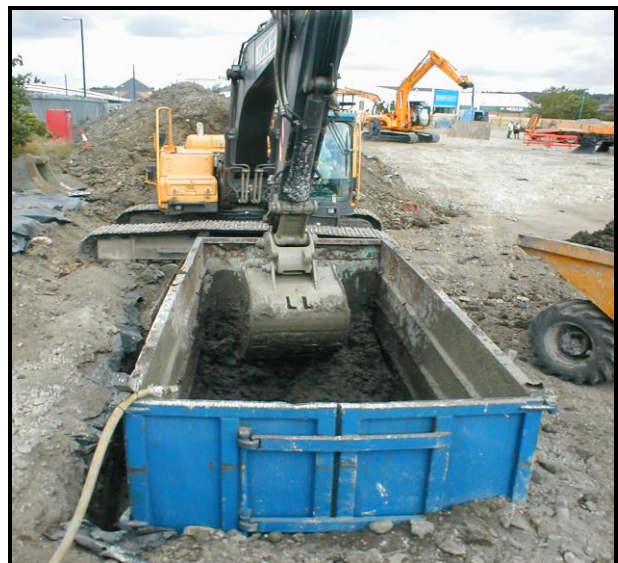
The processing bucket mixing contaminated soils with E-clay® slurry
